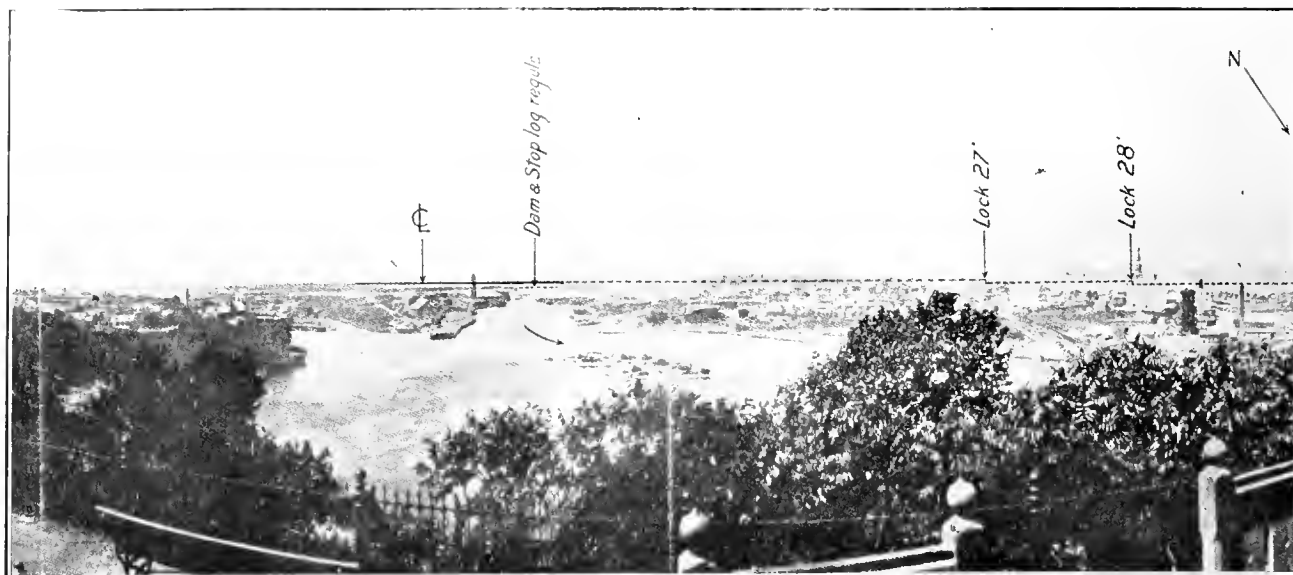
Hull, Quebec, Showing Canal North of City.
